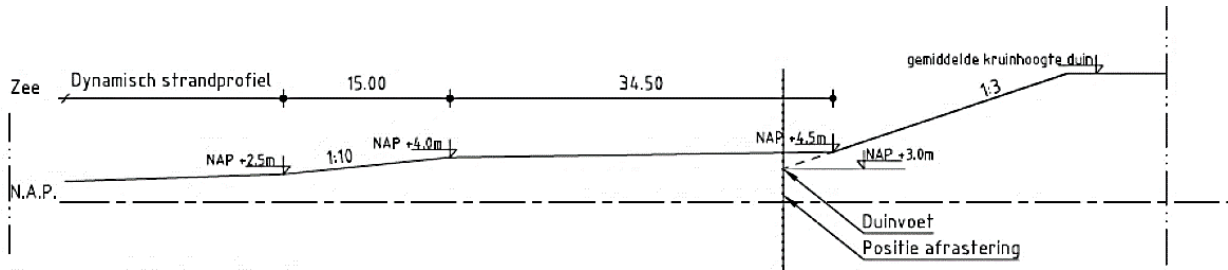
Design (requirement) of the beach profile to be constructed (Boer & Wouters, 2014).
